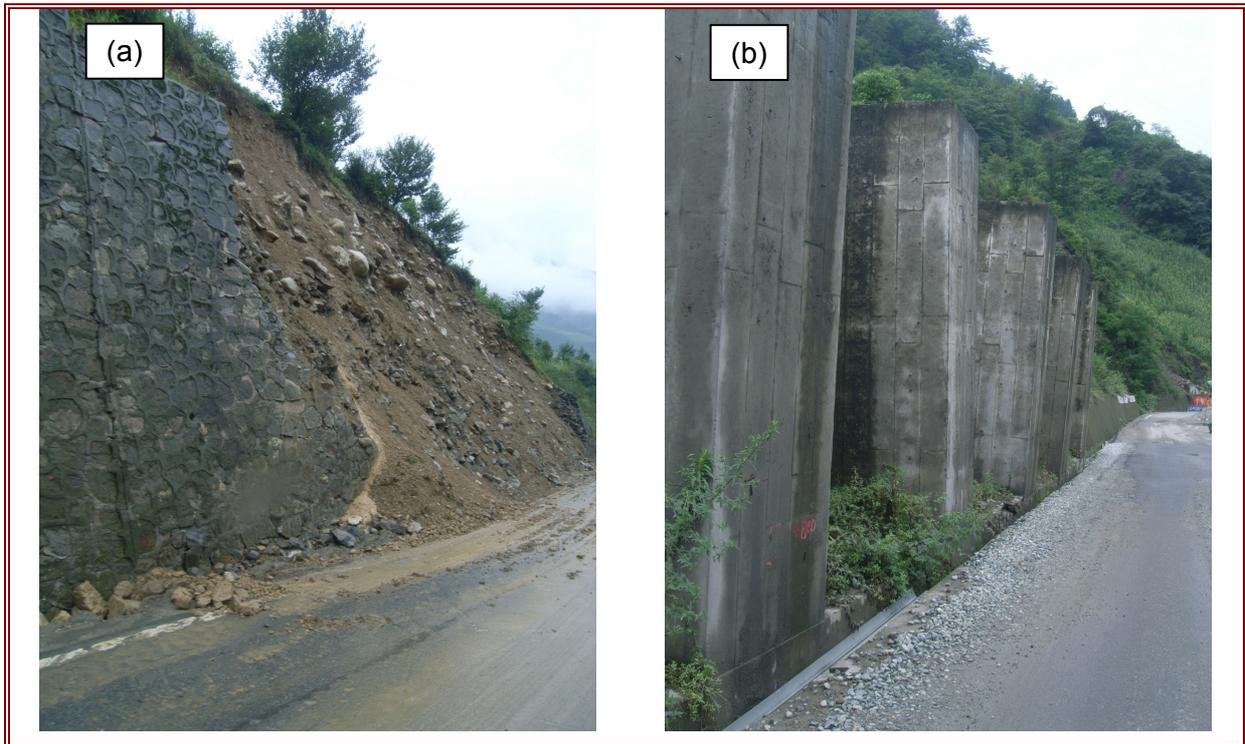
(a) Collapsed section of stone gravity retaining wall near Ying Xiu (b) Displaced section of RC bored pile retaining wall stabilizing a pre-existing landslide to protect the road, near Ying Xu.
